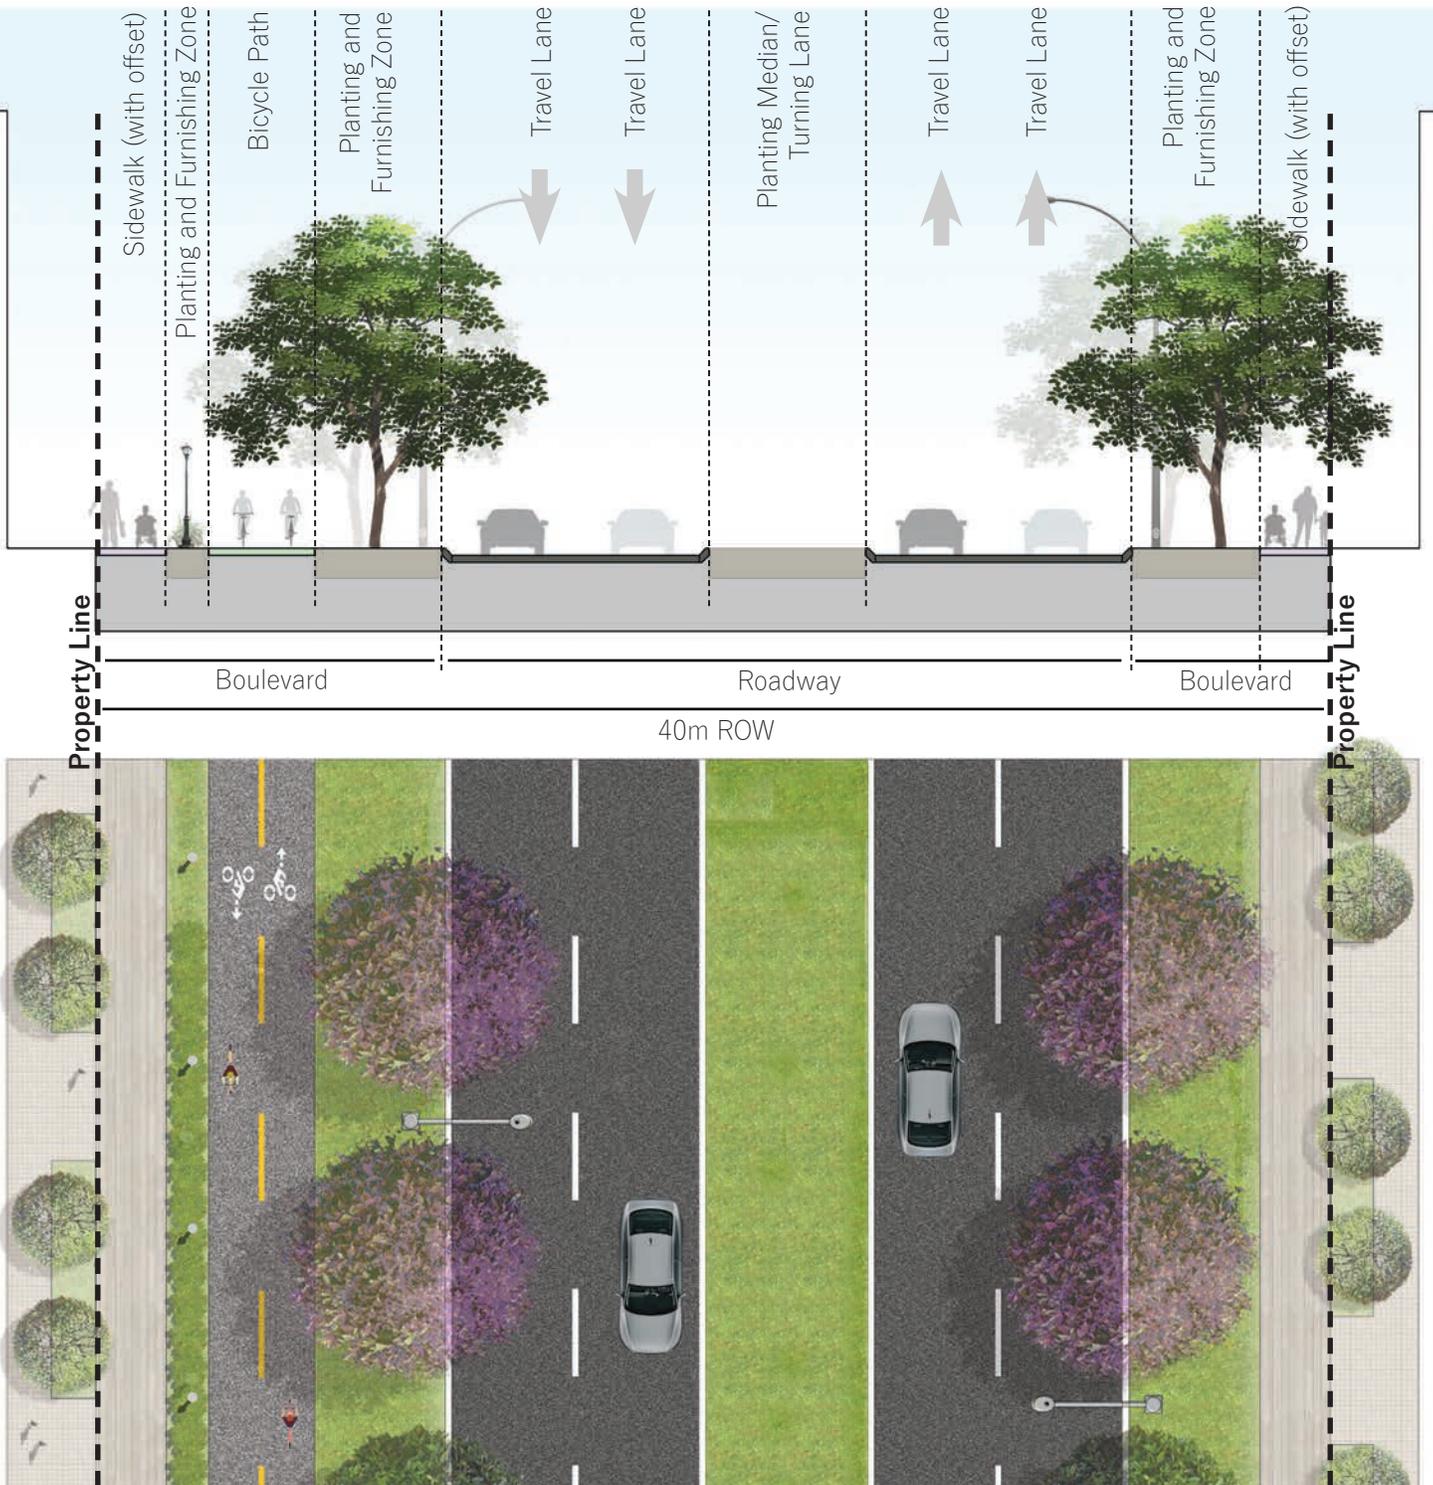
Type A Arterial (Alternative) Cross-section and Plan
